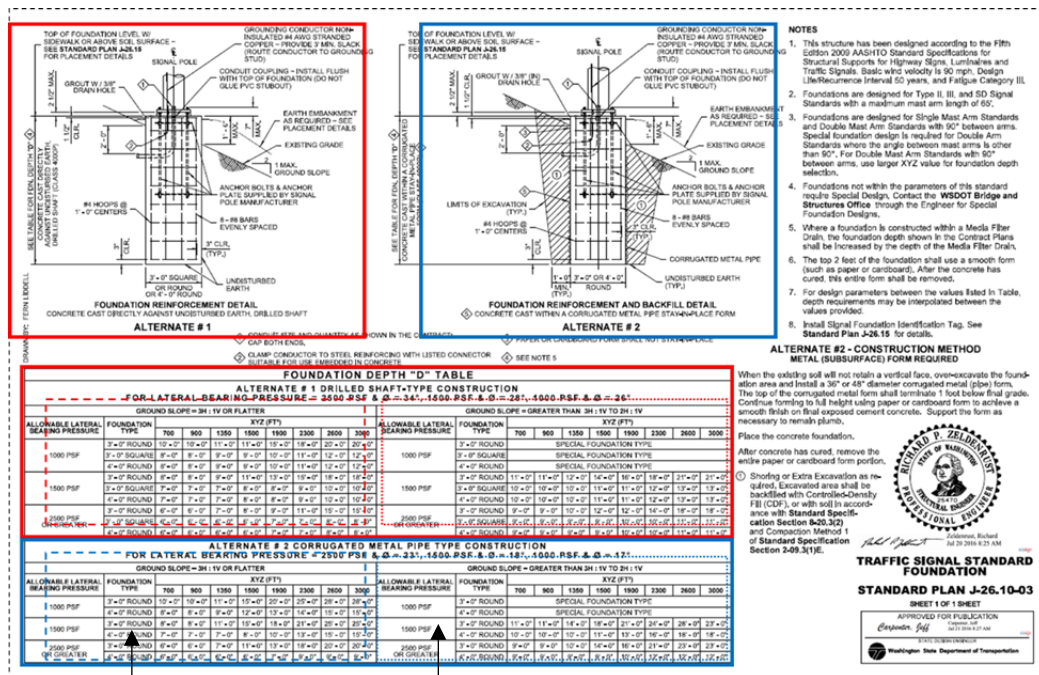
Washington Plan J-26 Document (WSDOT 2018)
